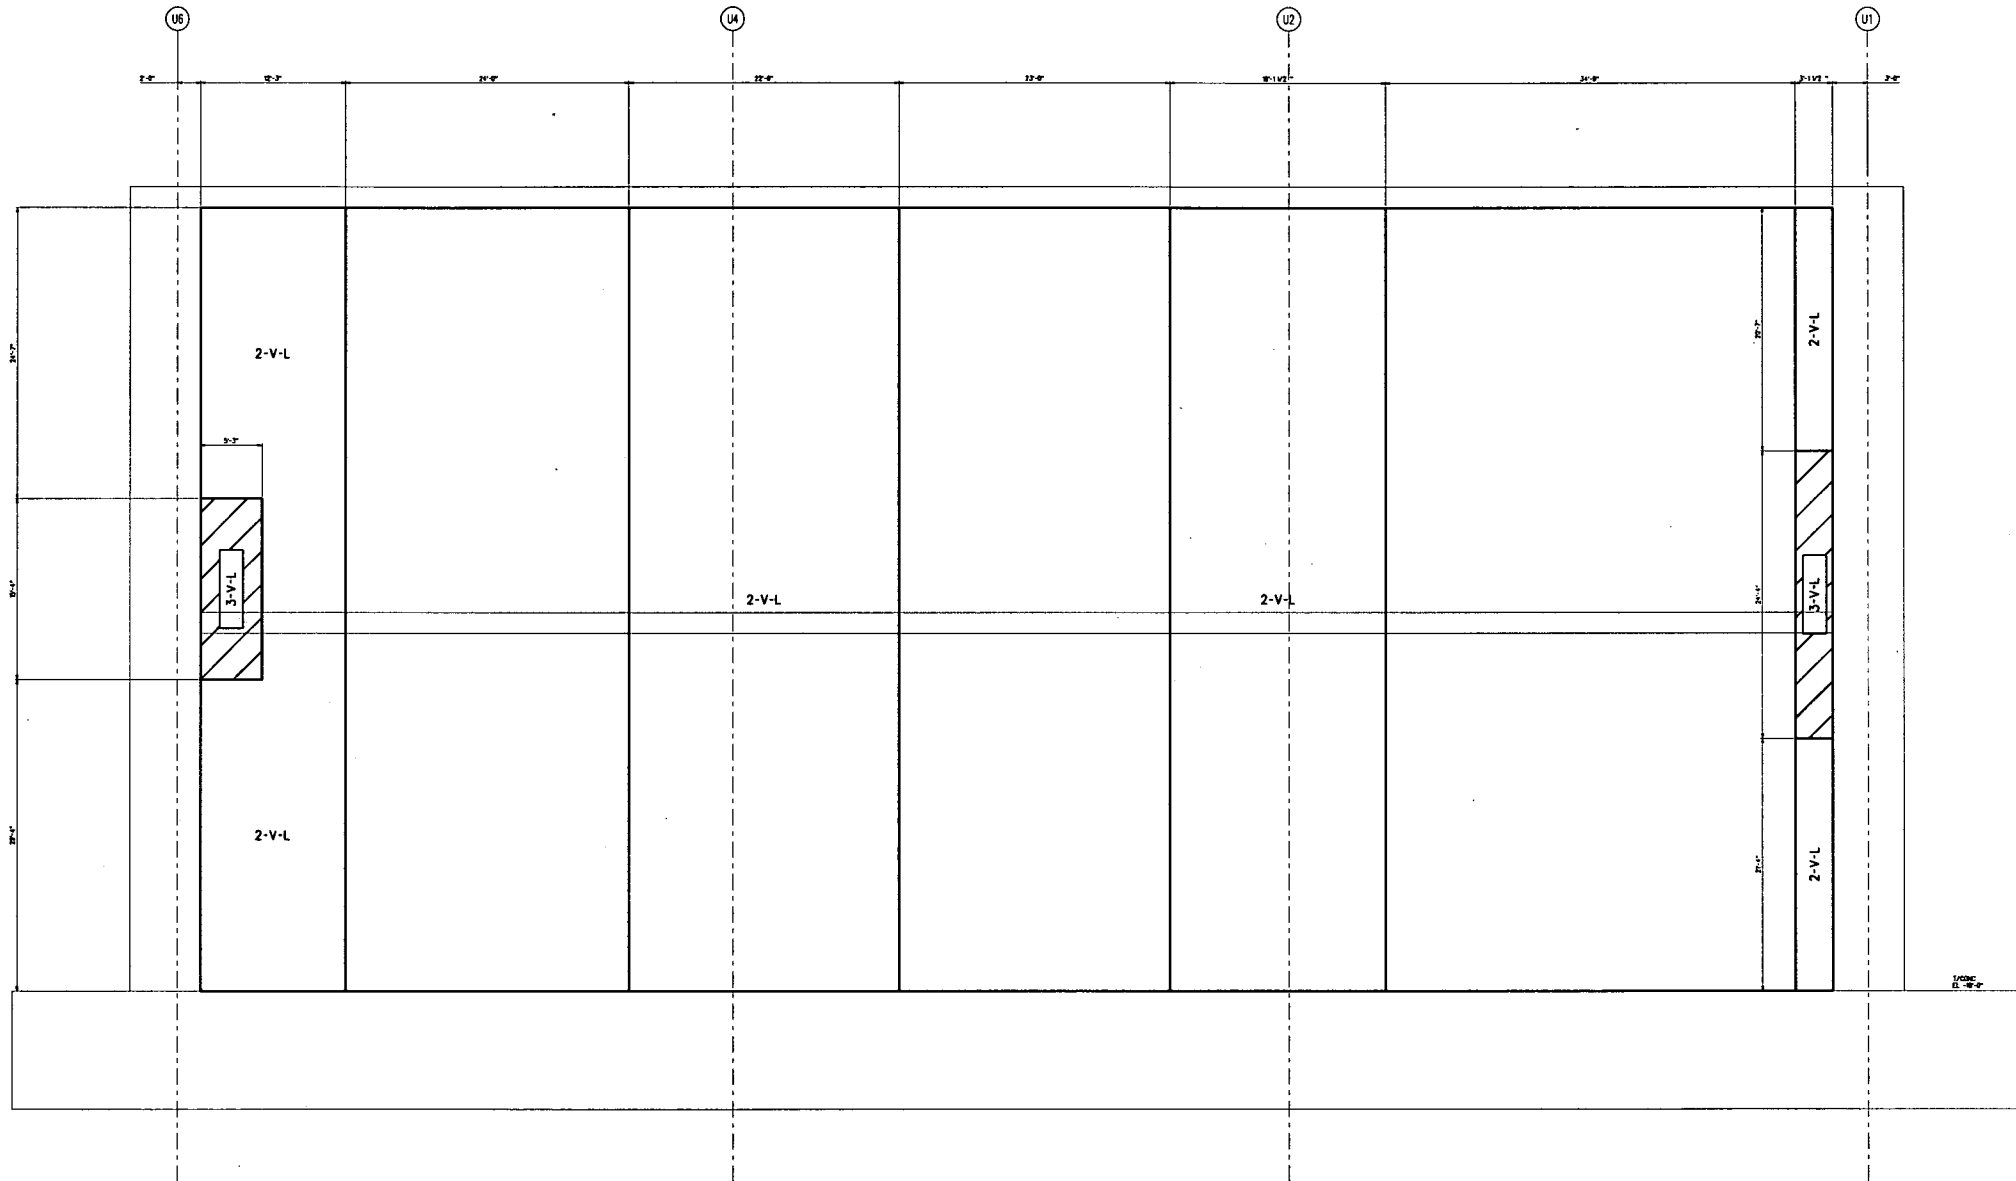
H.6-55: PUMPHOUSE NORTH WALL LOOKING SOUTH
